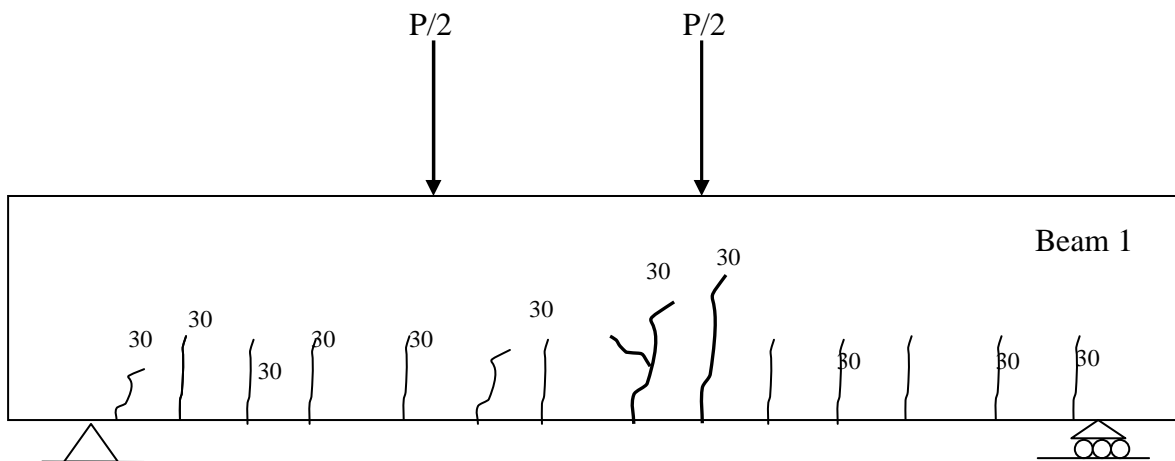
Crack pattern on beam 1 (Undamaged)
